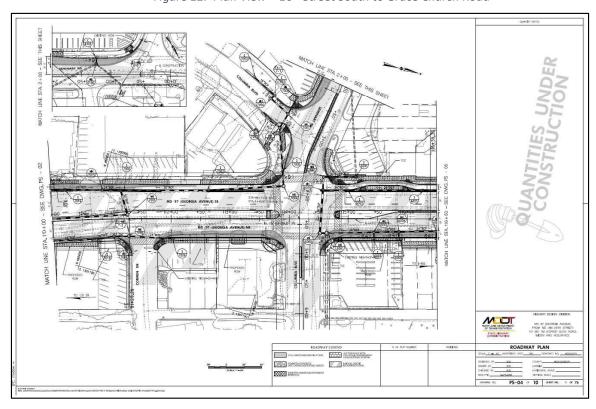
Plan View – Georgia Avenue at Columbia Boulevard/Seminary Road
